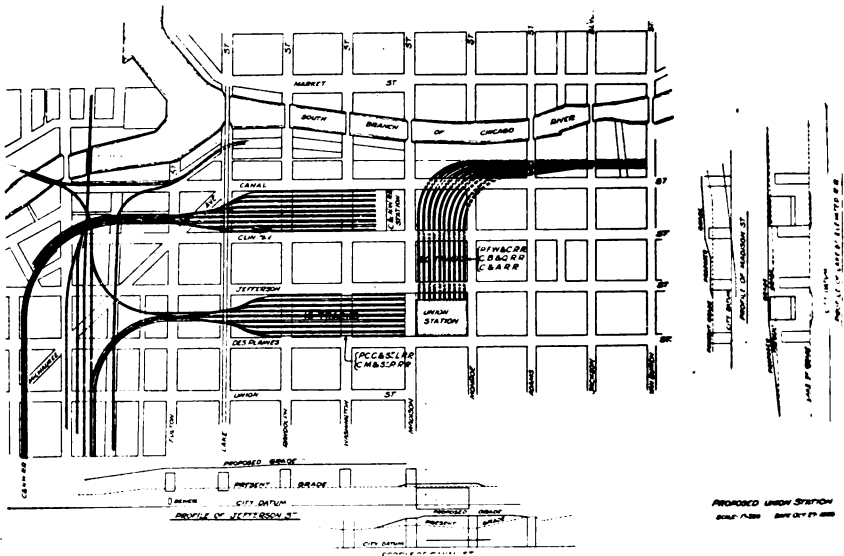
A TWO-LEVEL STATION PROPOSED ON WEST MADISON STREET.
